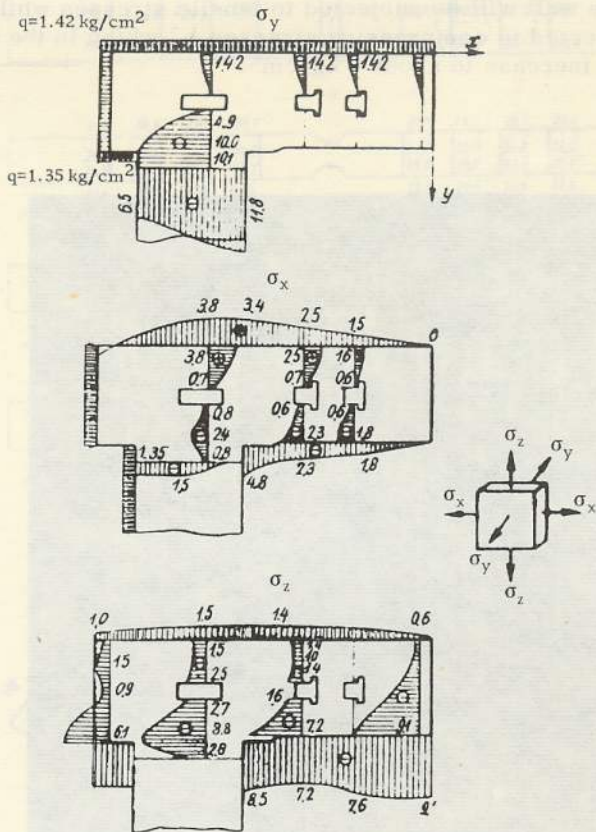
Diagram of stresses in a horizontal section of a lock-head wall
